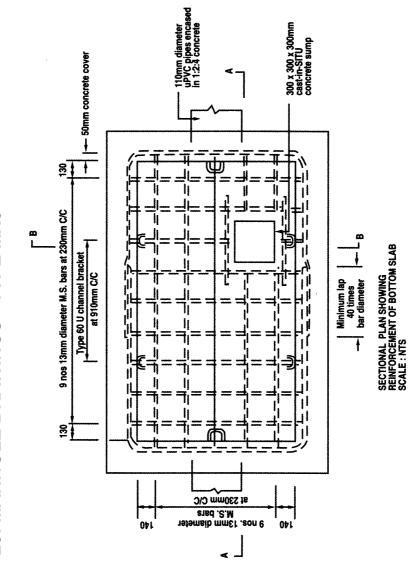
MANHOLE DRAWINGS - TYPE MX3
